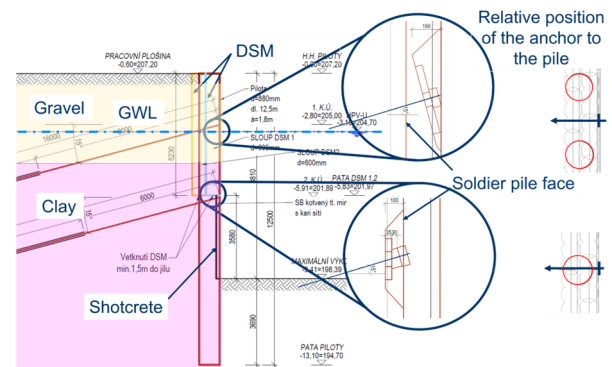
Details of the anchor heads in a section with two anchorage levels.
